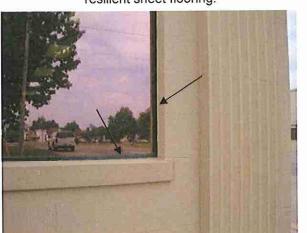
Exterior window caulk (gray) and exterior building caulk (brown).
